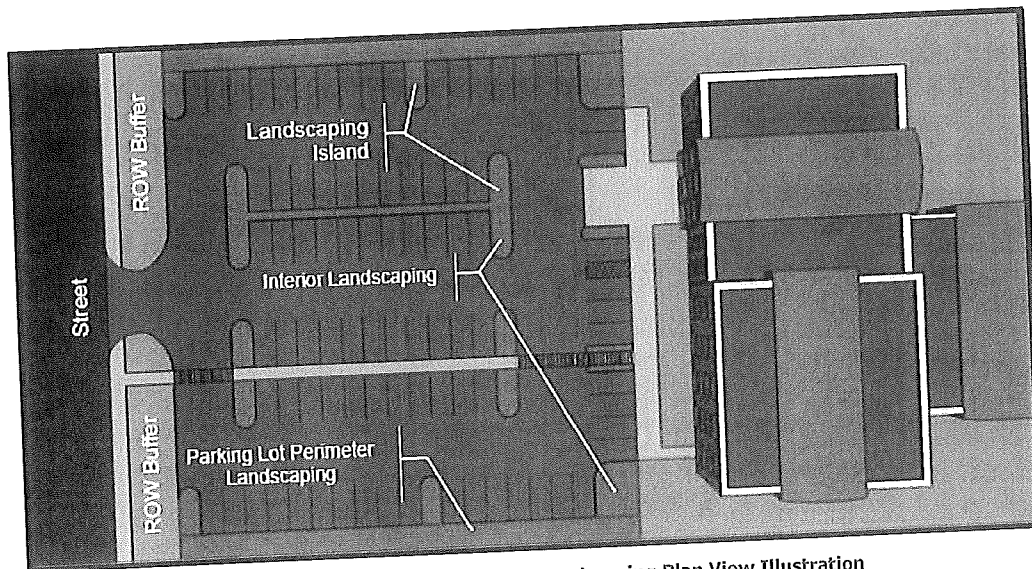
Island, Interior, and Perimeter Landscaping Plan View Illustration
